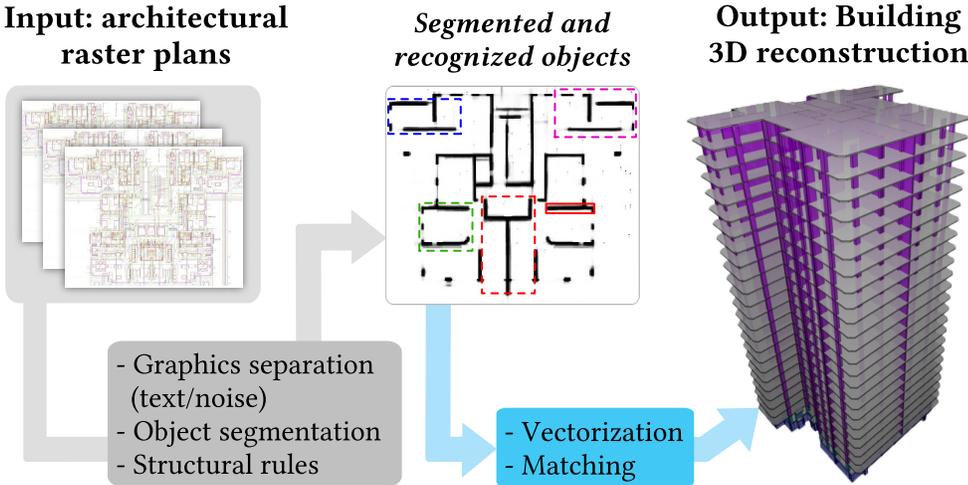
Reconstruction method of a 3D building structure from rasterized input plans.
